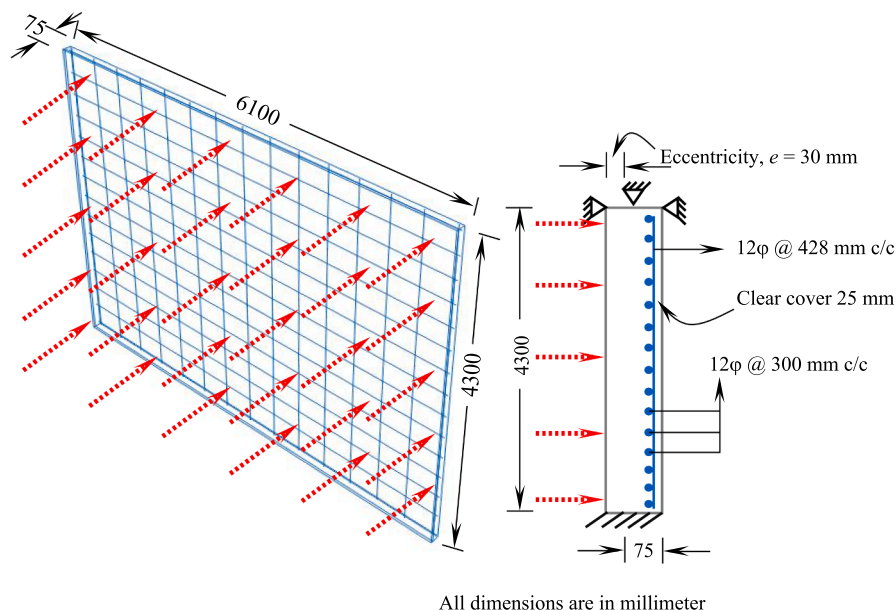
3-D view showing blast exposure and sectional cross-section view showing reinforcement details.
